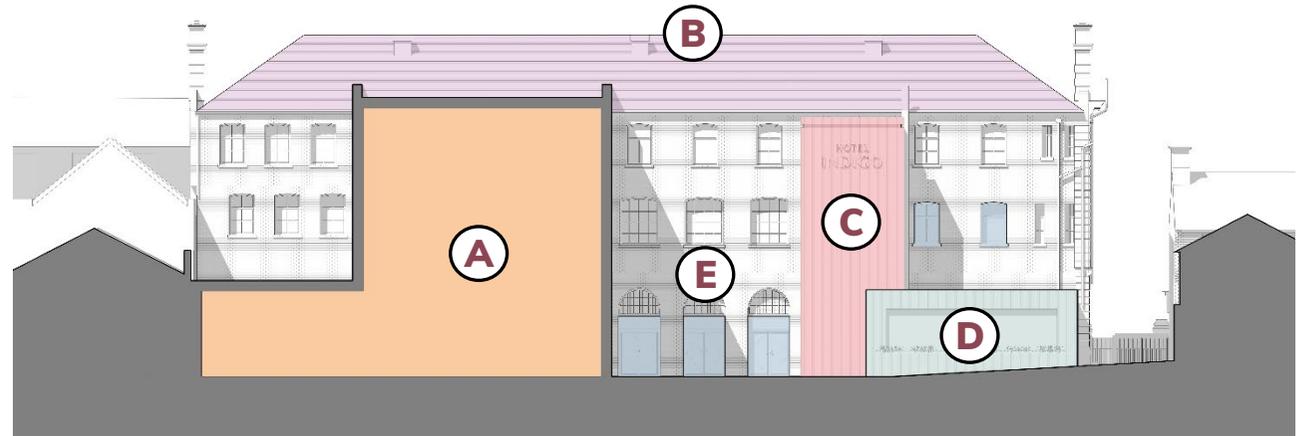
Proposed Alterations & Additions, Courtyard Façade, Post Office
